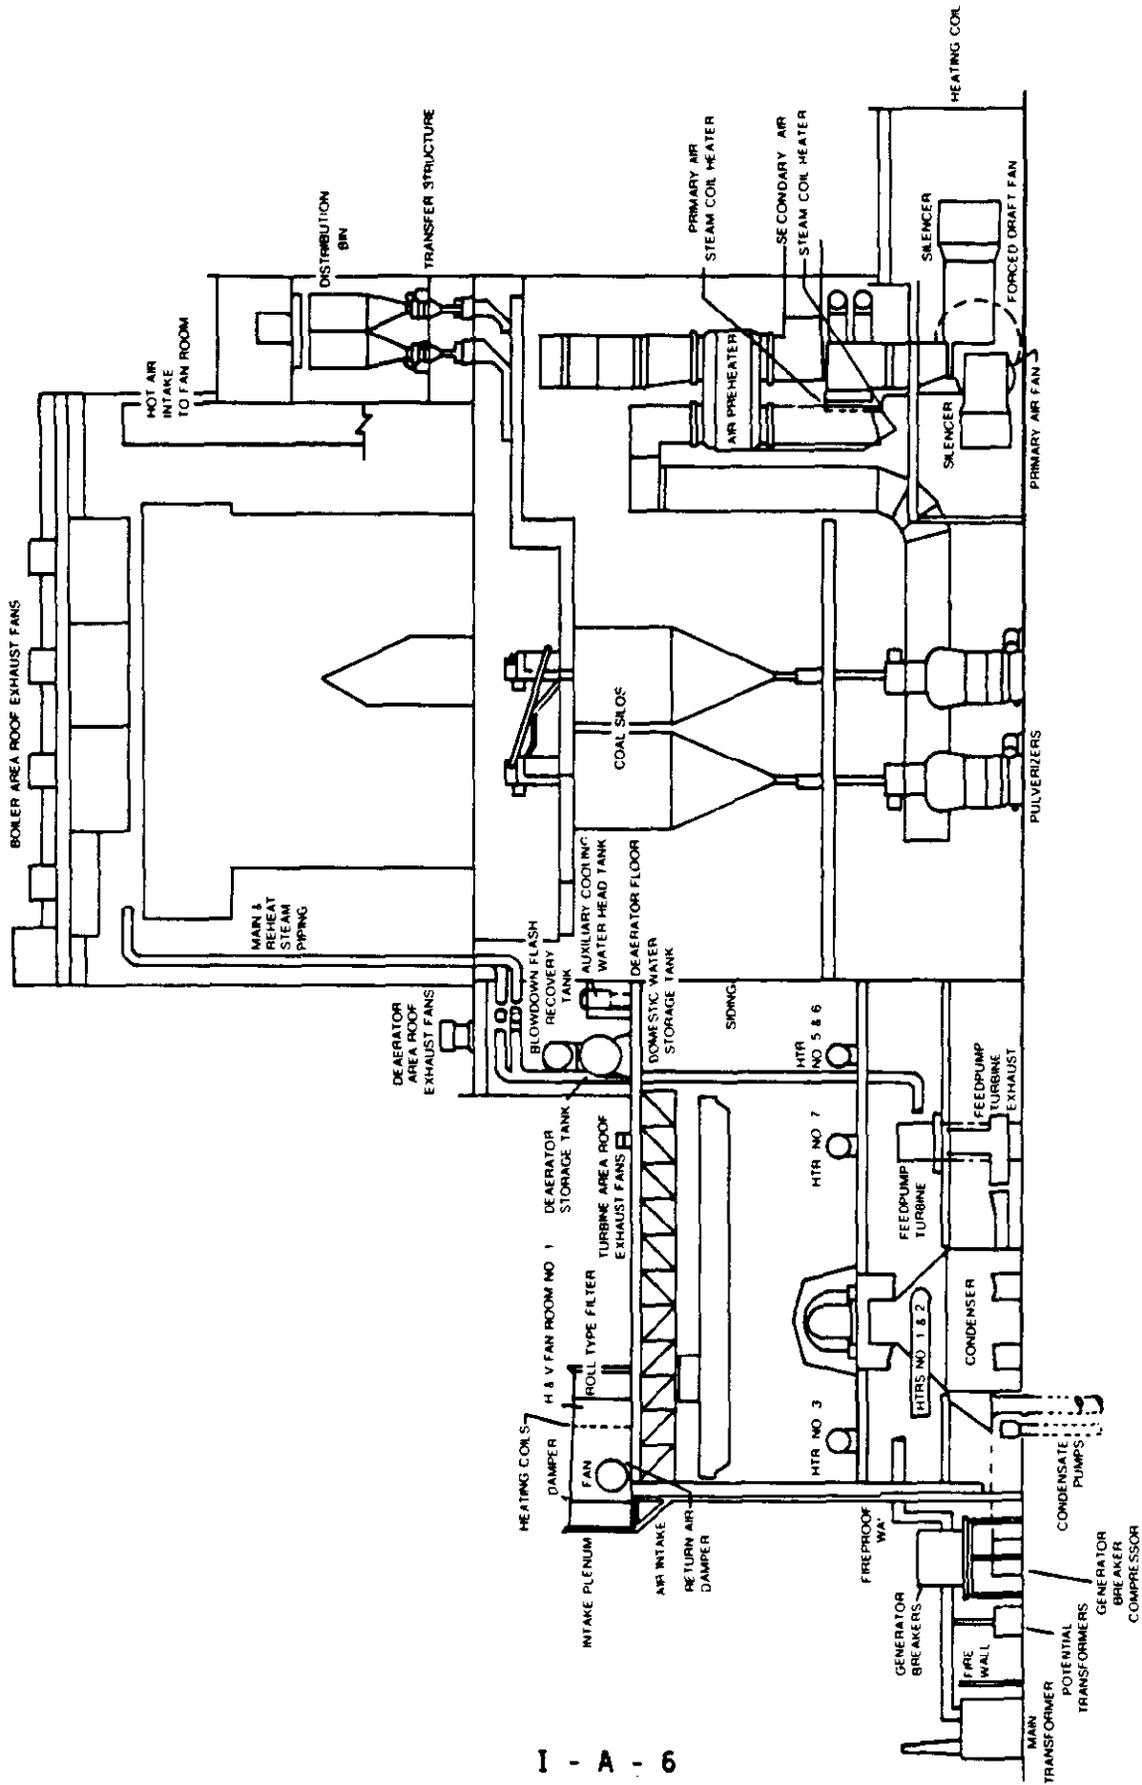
250 MWe Reference Plant Arrangement Elevation
